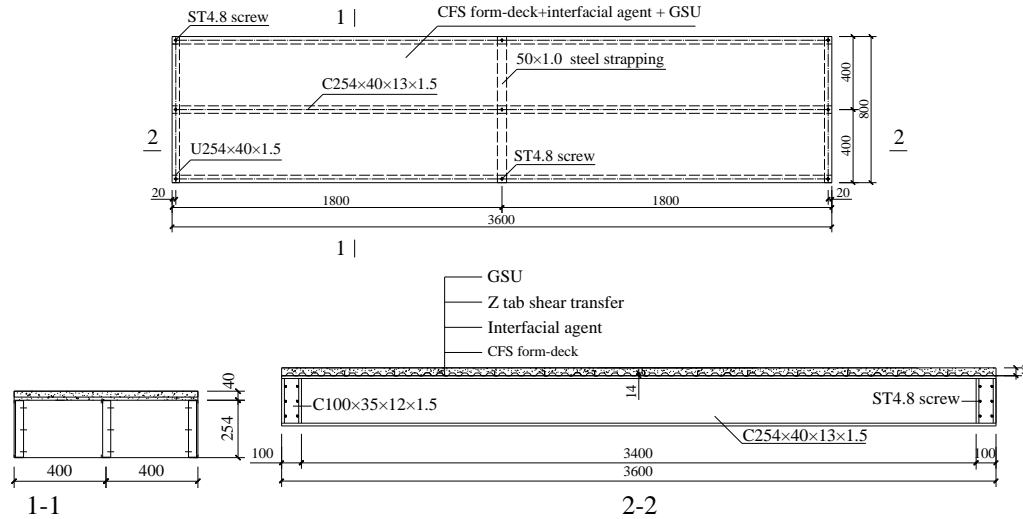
Dimensions of specimen BM-1 (all dimensions in mm)
